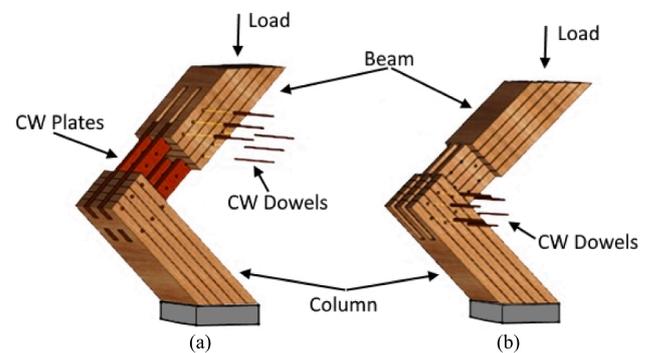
Connection types and components, (a) Modern design connection type (Design -I-1) with CW plates and dowels and (b) Traditional mortise and tenon design connection type (Design-I-5) connected with CW dowels.
